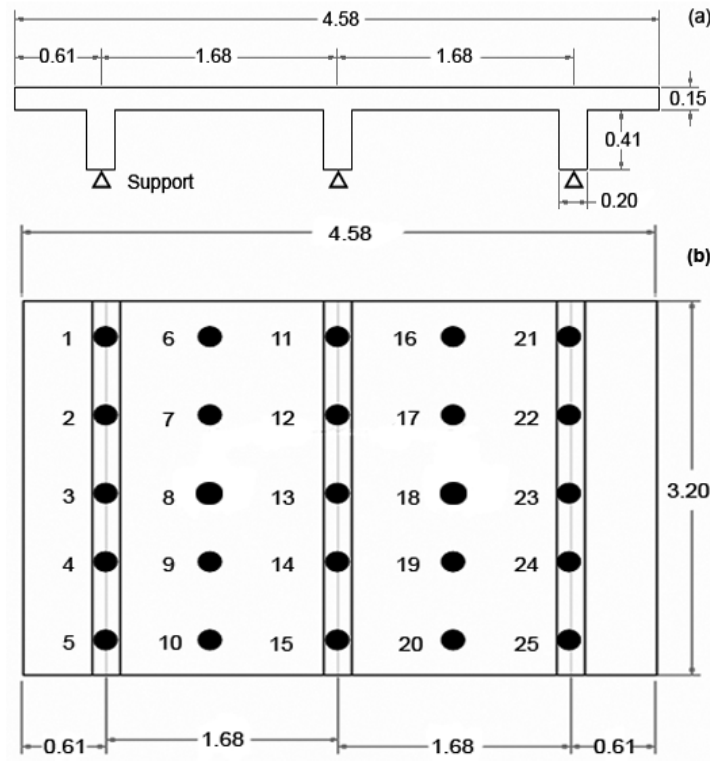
Schematic of Test Structure: (a) Elevation (b) Plan View and Location of Accelerometers (Unit: m)
